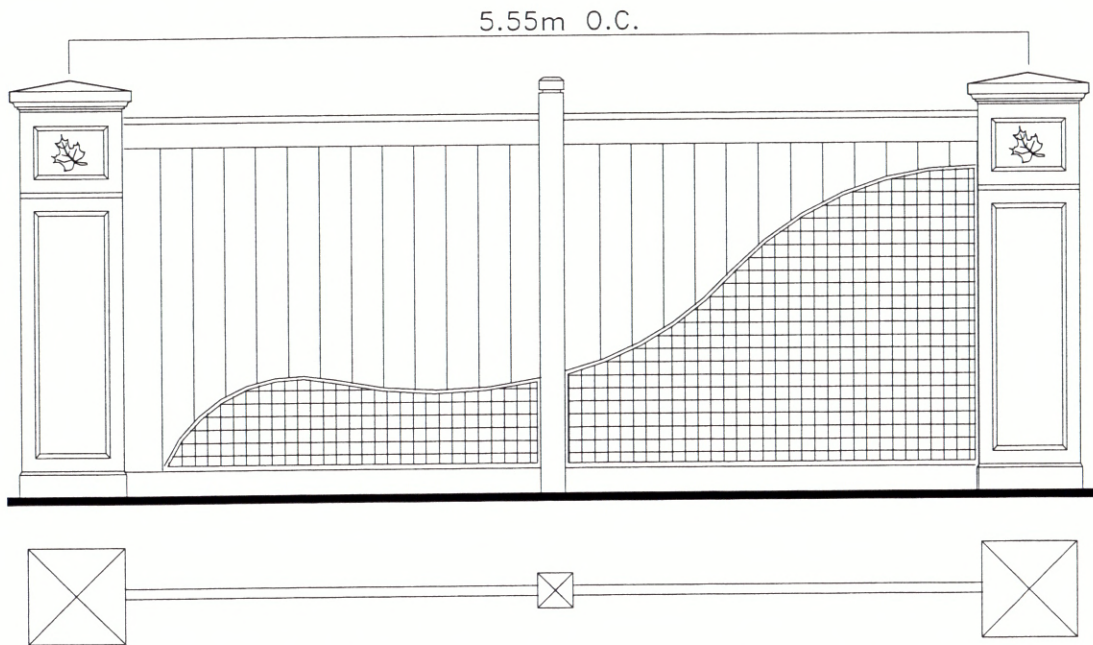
ELEVATION OF WOOD FEATURE PANEL AND FLANKING PILLARS N.T.S.
